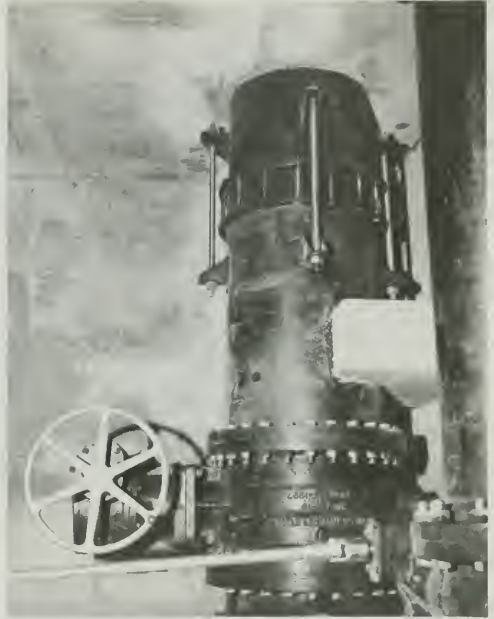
Outlet Works—Butterfly Valve in Outlet Structure
